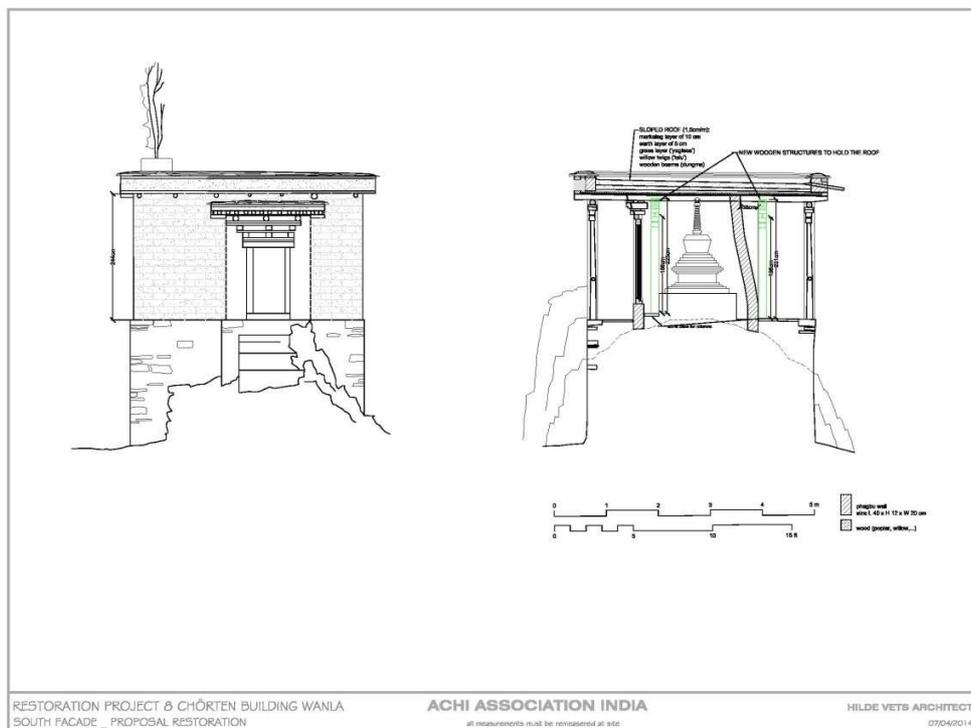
Restoration proposal: section dd april 2014 (drawing: Hilde Vets)
